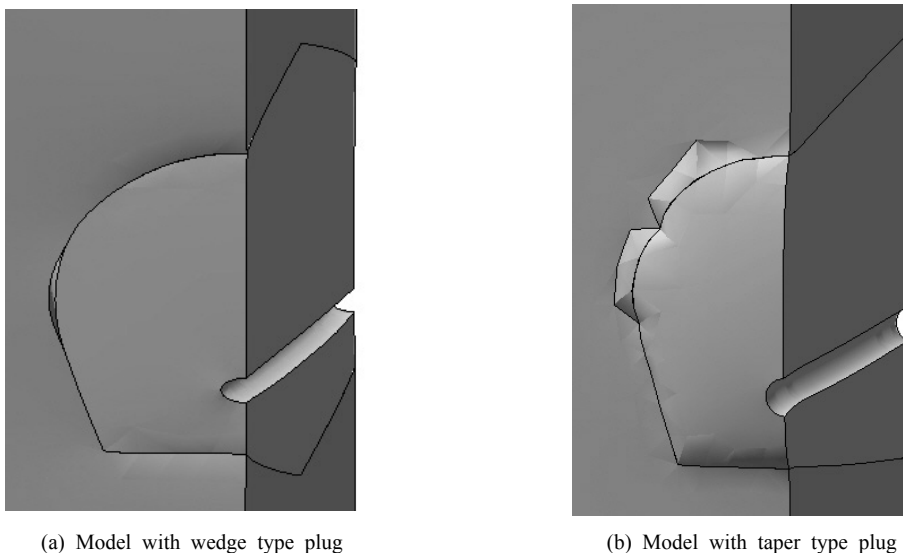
Deformed shapes of concrete plugs and surrounding rock masses (x100)
